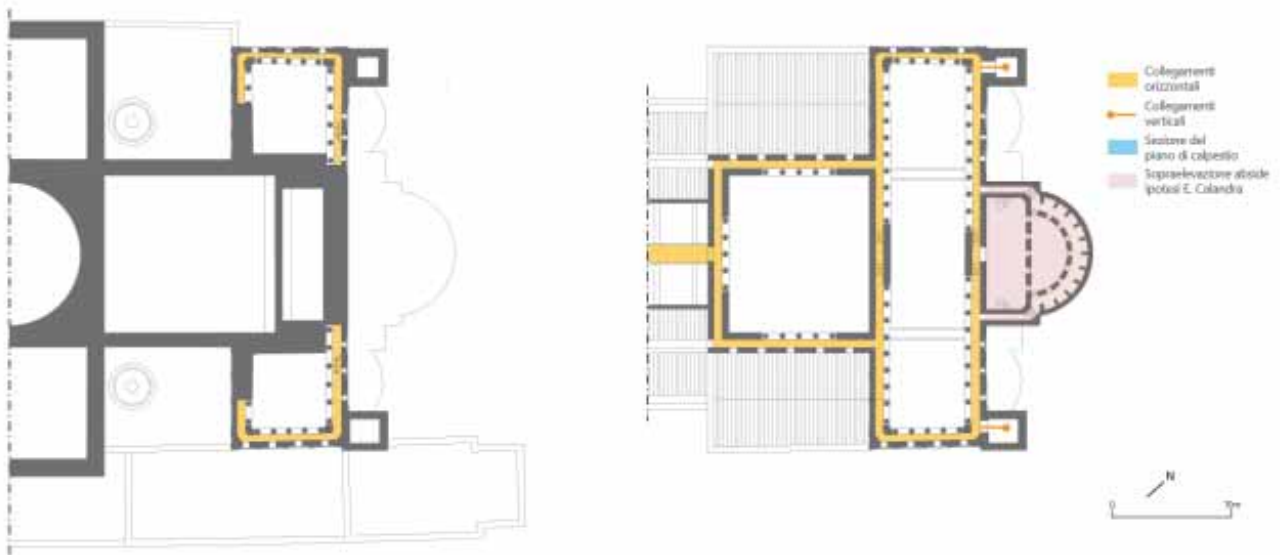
Clerestory: plan of the present layout; Fig.8 - Clerestory: plan of the reconstructive hypothesis
